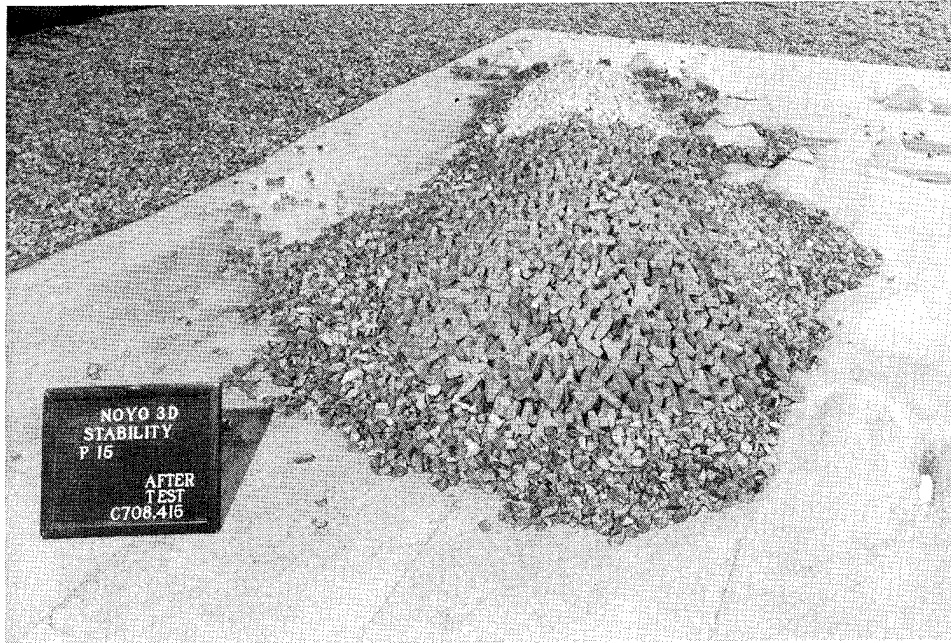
Plan 15, north roundhead after five series of Storm IB waves
